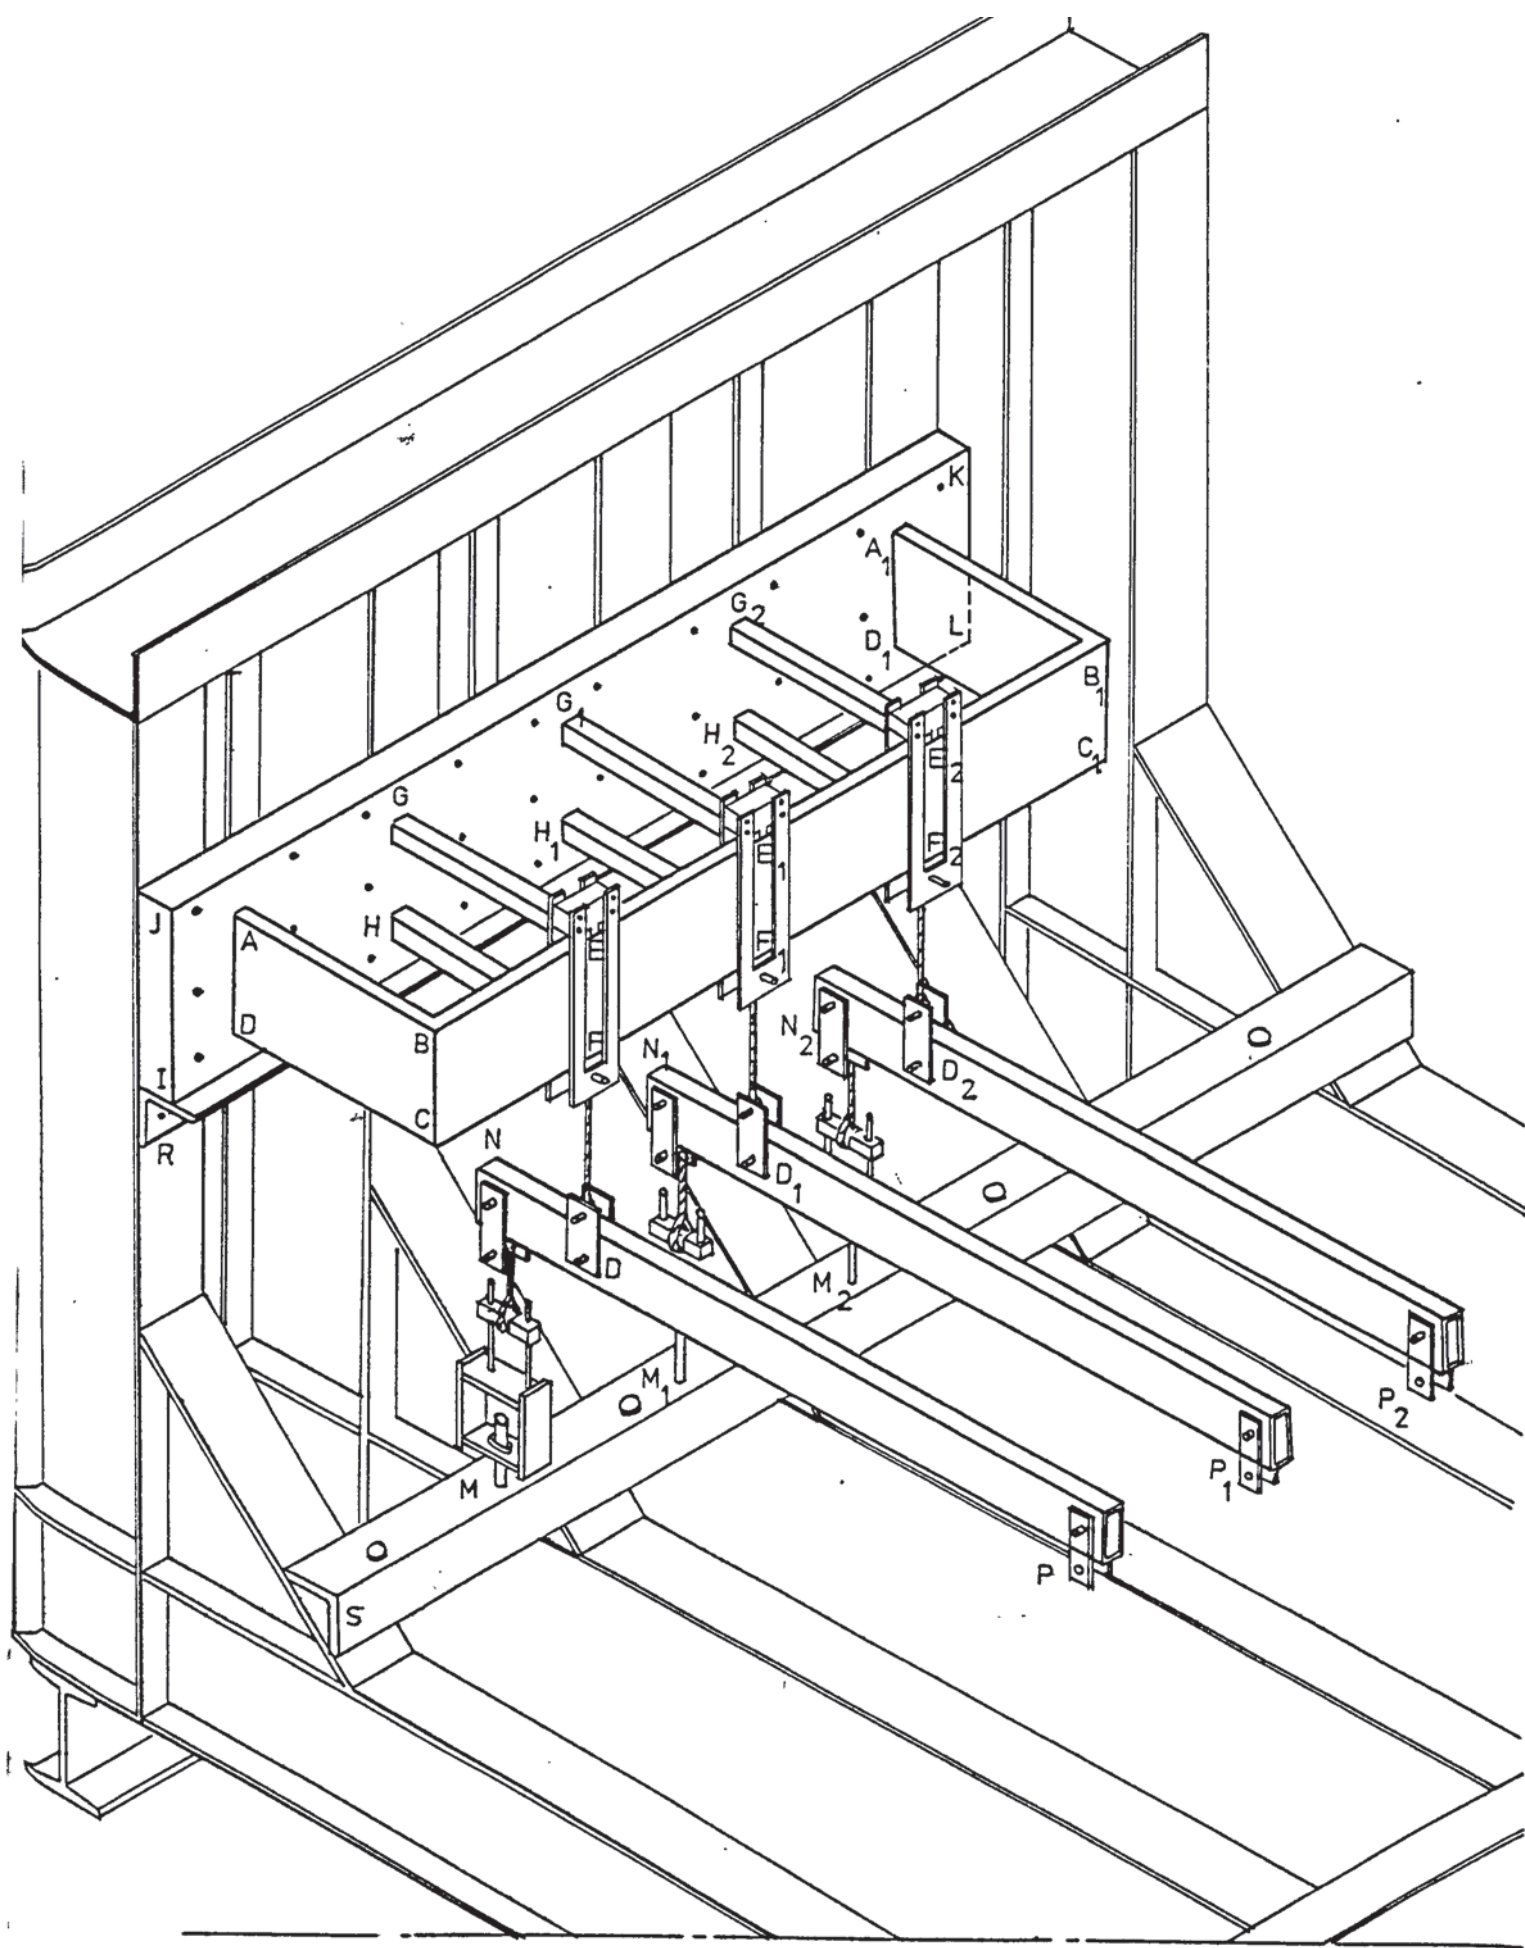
A STRUCTURE AND LOADING ARRANGEMENT
